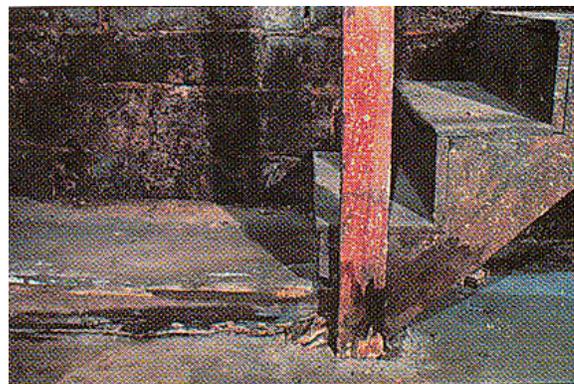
To prevent termite infestations, do not allow wood form boards to be embedded in concrete as shown in this basement.
